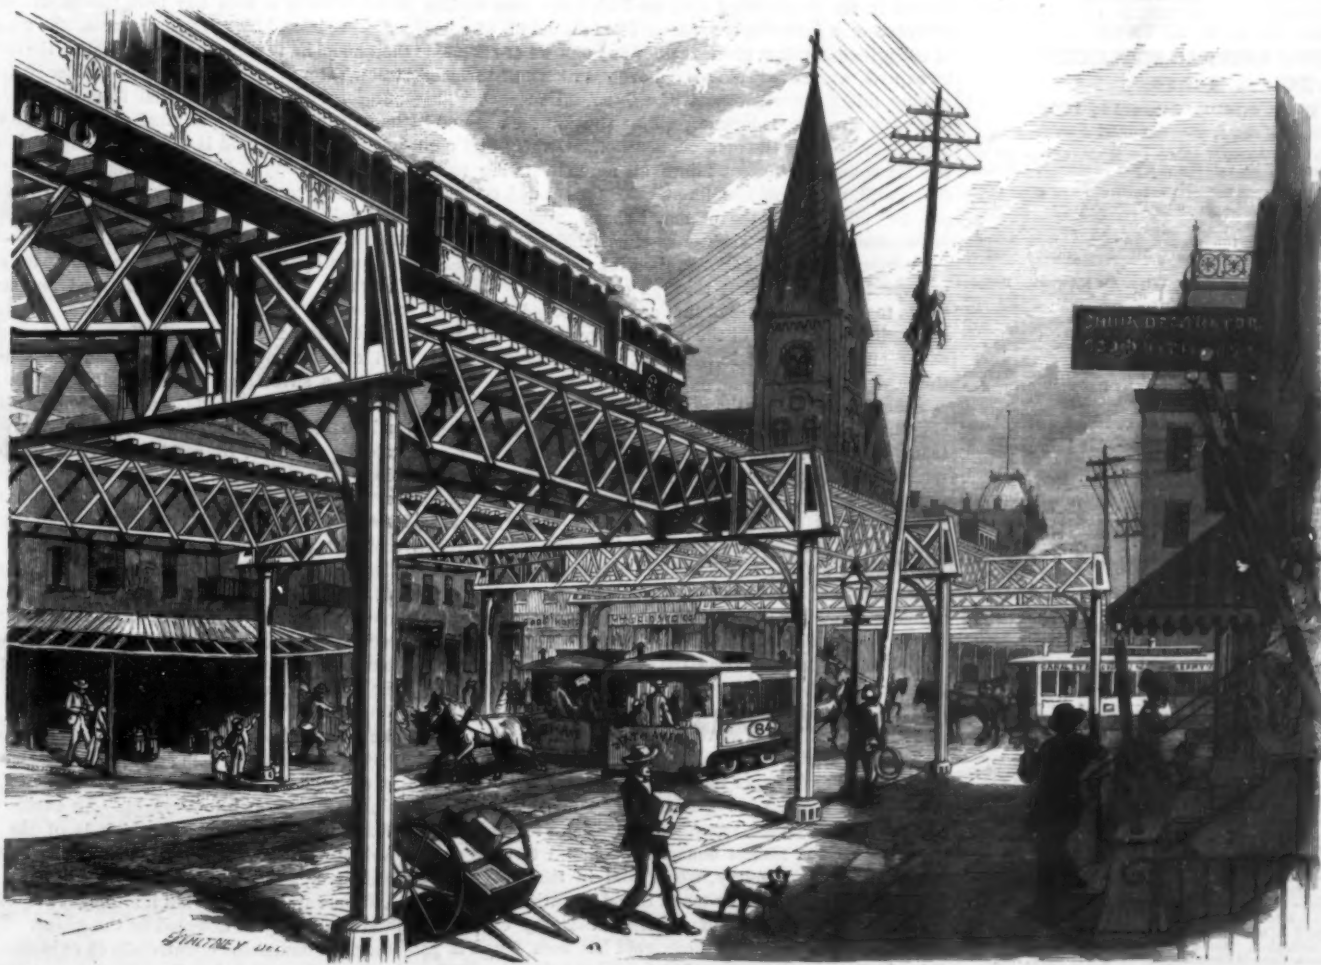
ELEVATED RAILROAD, WEST BROADWAY AND CANAL STREET.
